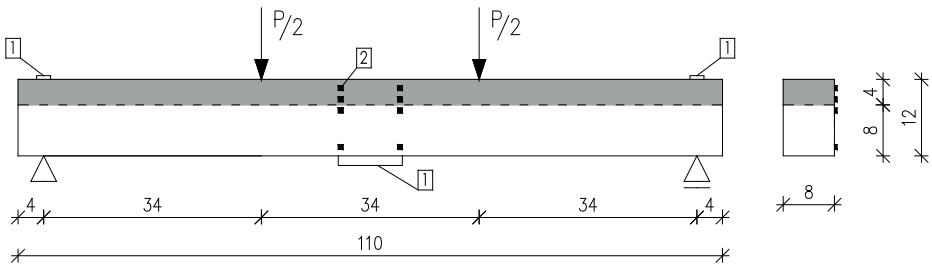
Loading scheme and cross section in tested beams.(Sadowska-Buraczewska,2012)
